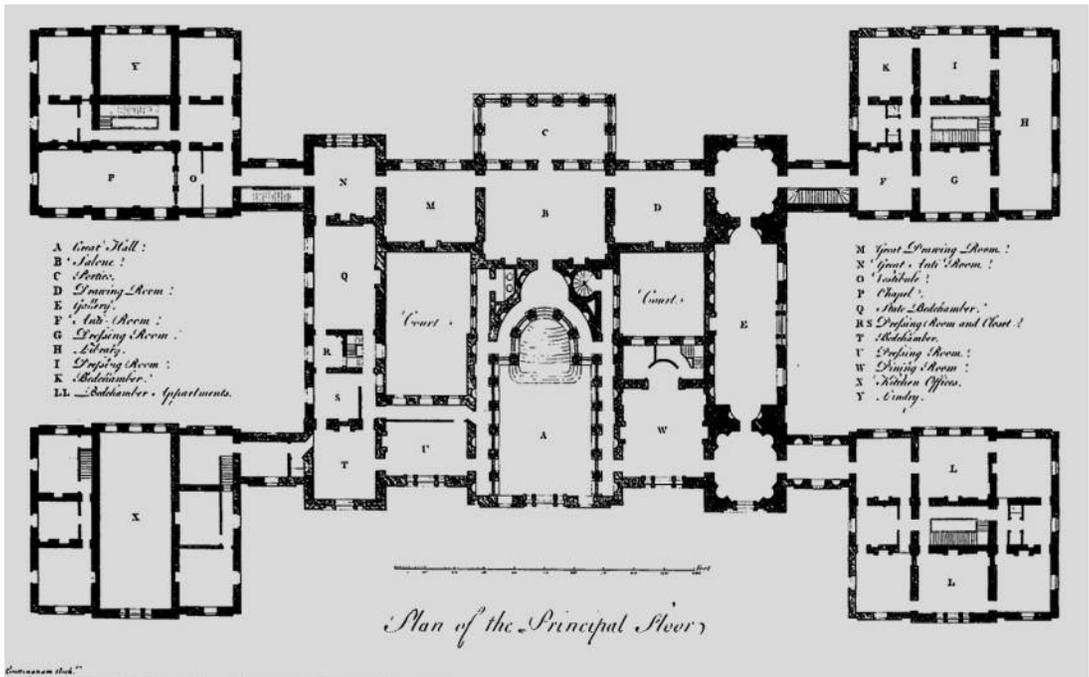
Holkham Hall, plan from M. Brettingham, *The Plans, Elevations and Sections of Holkham* (1761).
